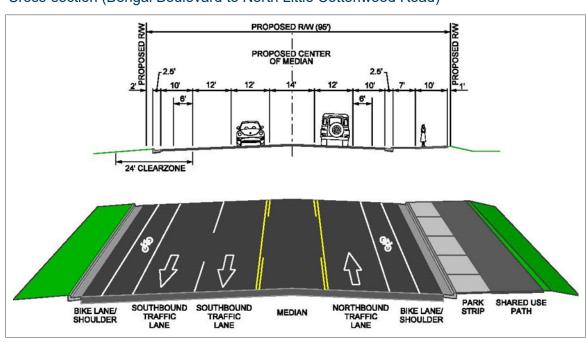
Wasatch Boulevard Alternatives – Imbalanced-lane Alternative Cross-section (Bengal Boulevard to North Little Cottonwood Road)
